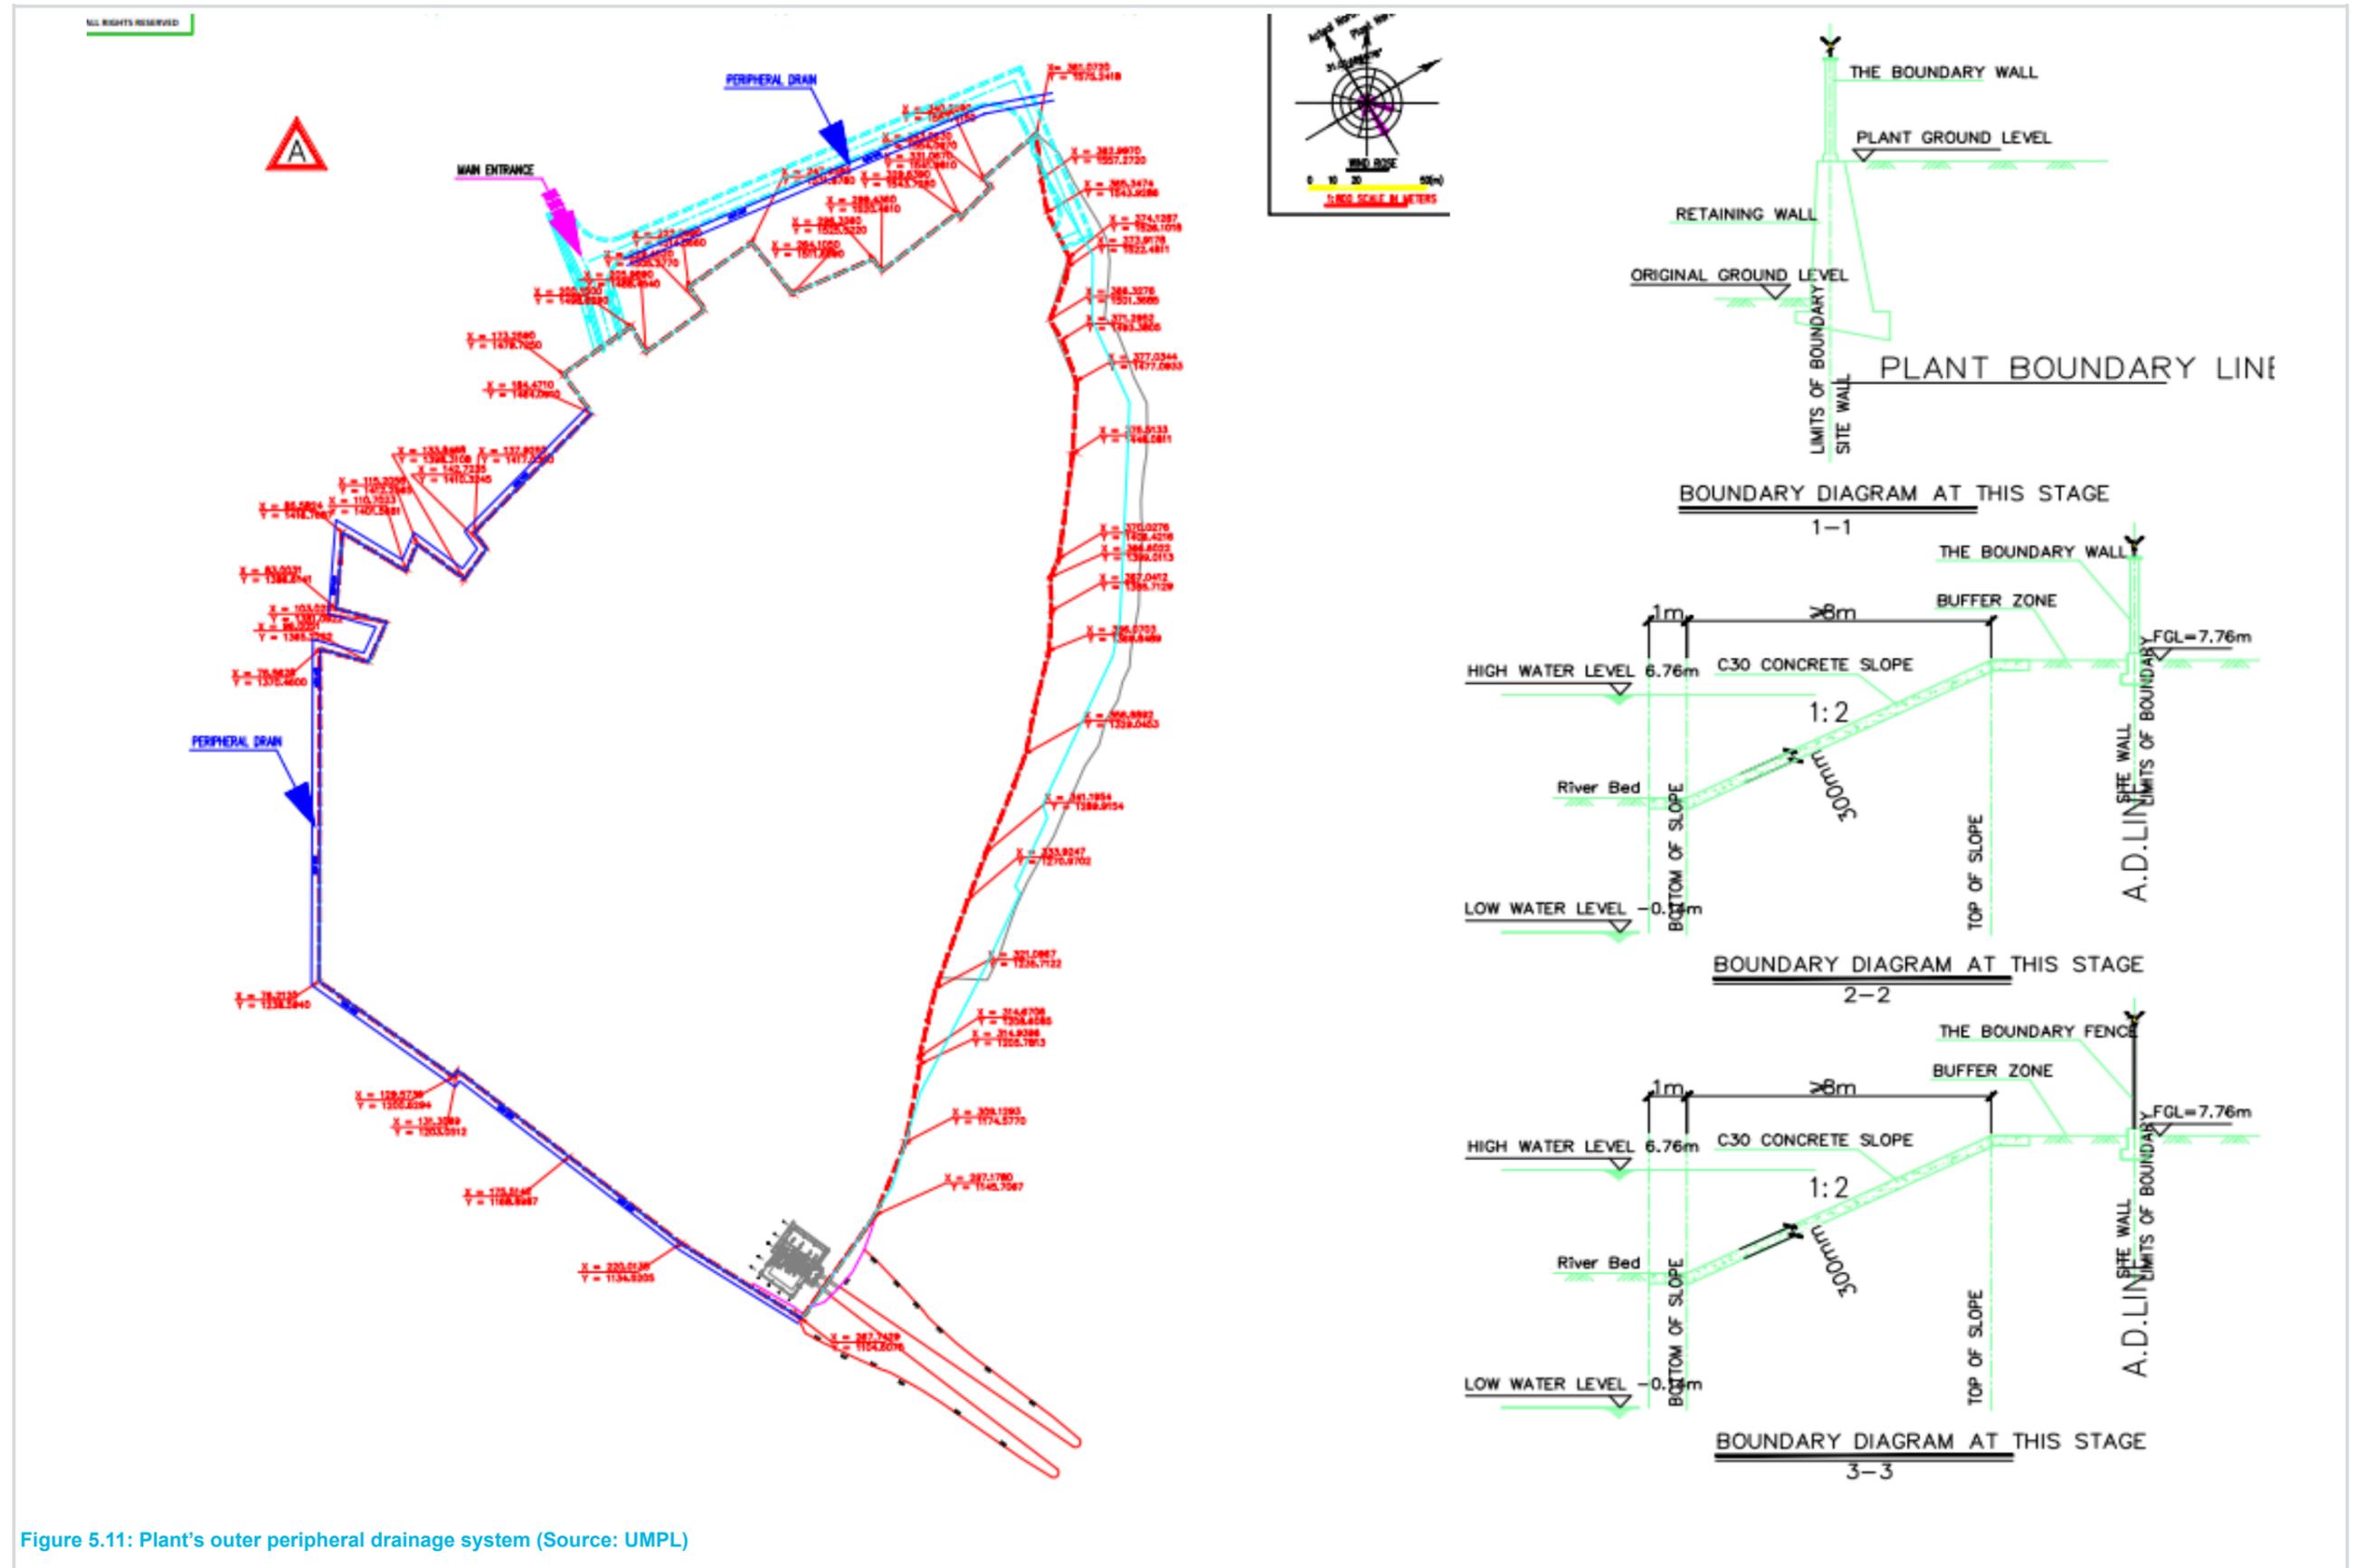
Plant's outer peripheral drainage system (Source: UMPL)
